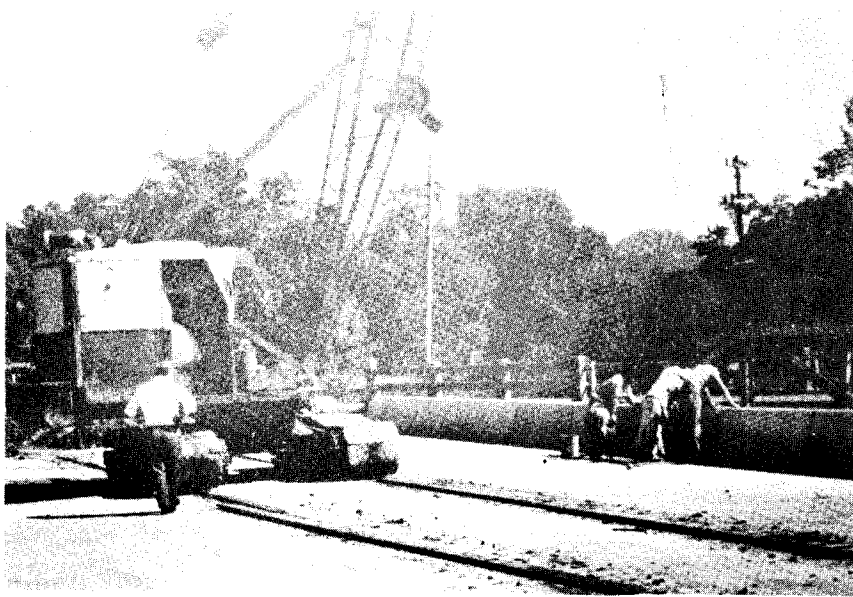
Precast parapet sections are adjusted for alignment on B604 in Norton.
